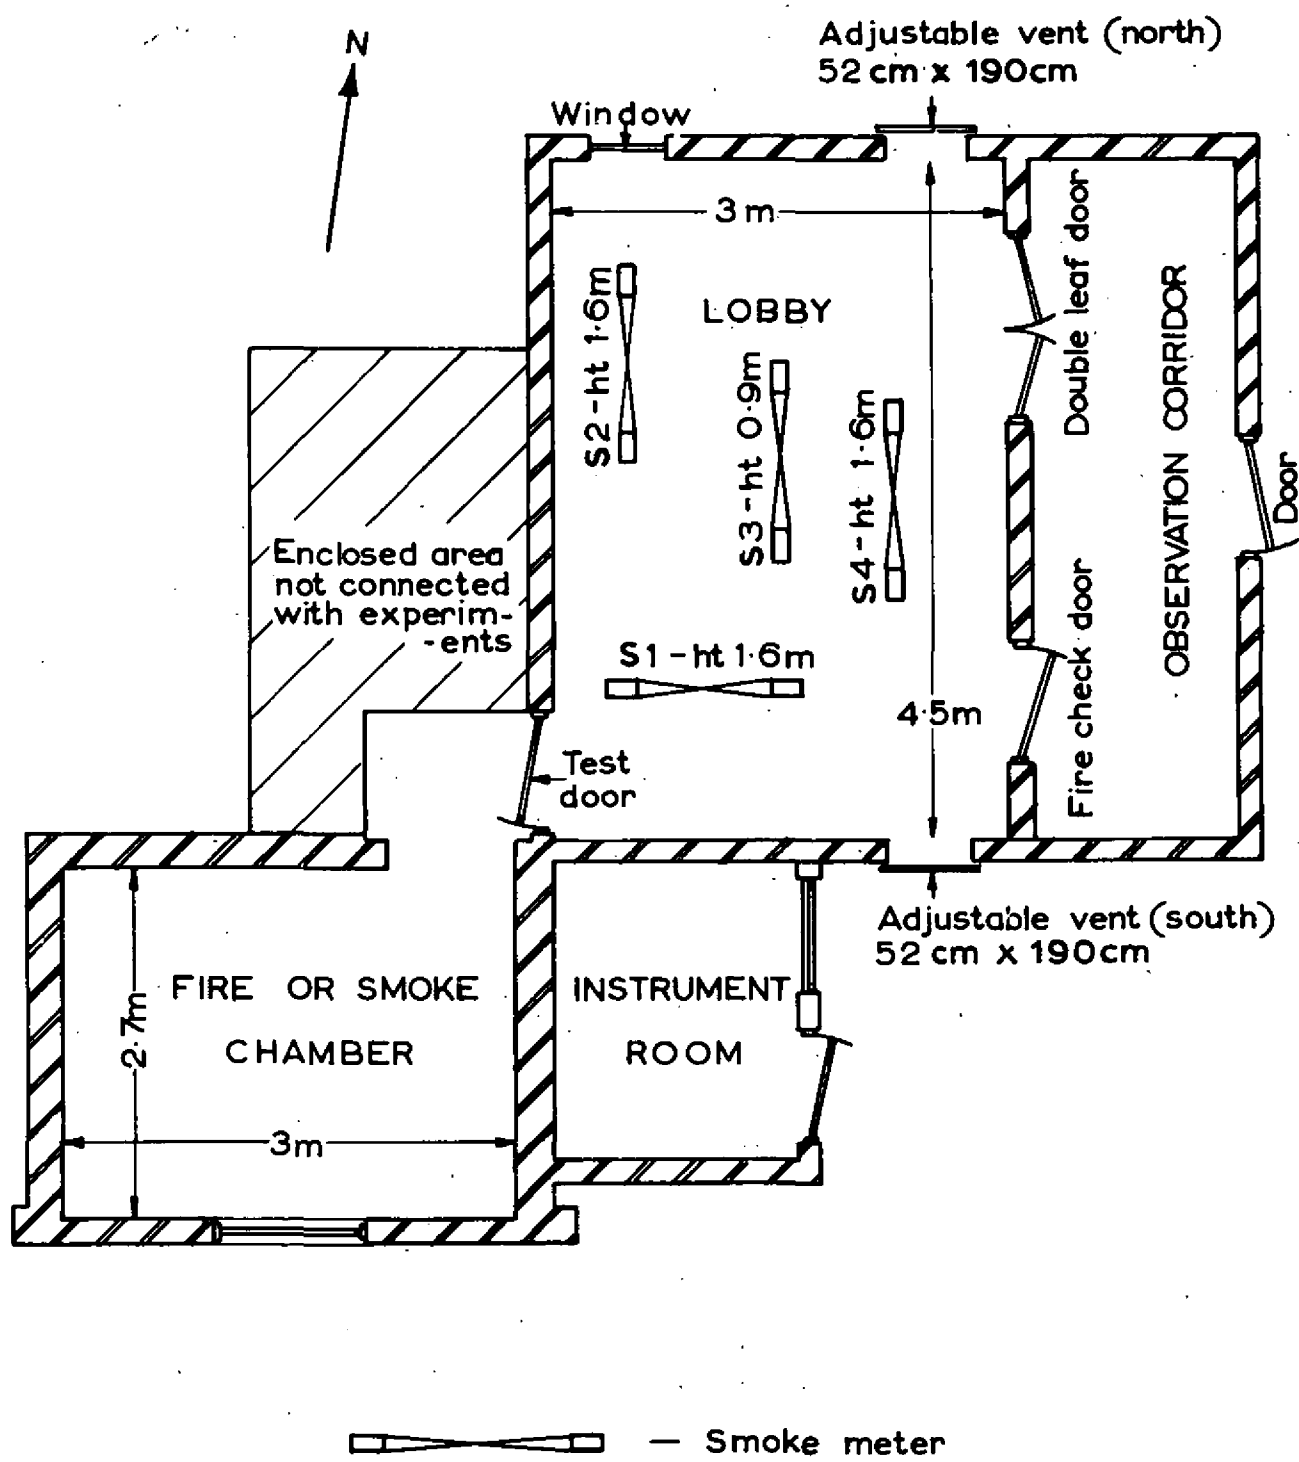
PLAN OF BUILDING FOR TESTS ON
